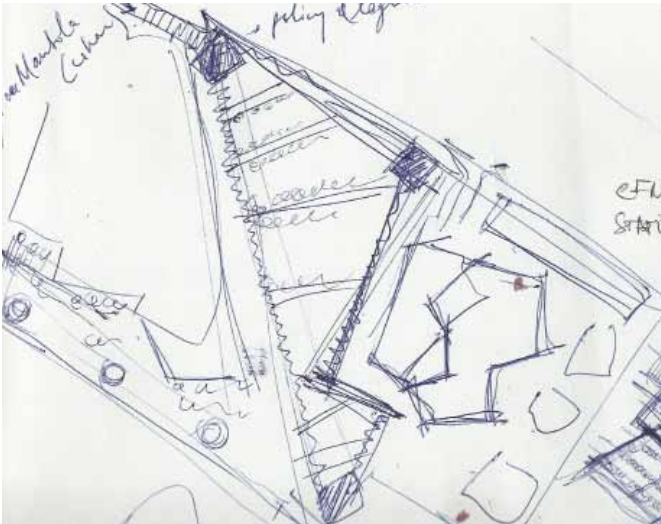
SITE PLAN REVISION 1 (AUTHOR, 2011)
